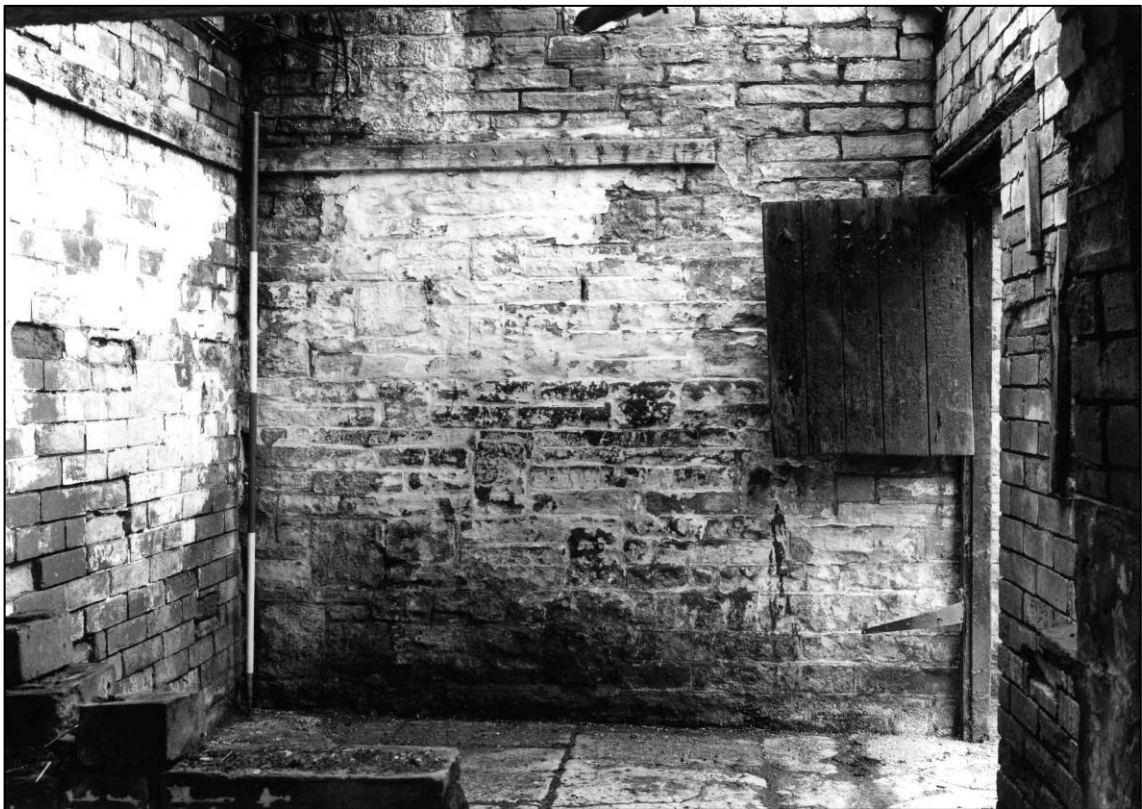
Building N1, central cell, west wall, looking W (photo 2/9).
